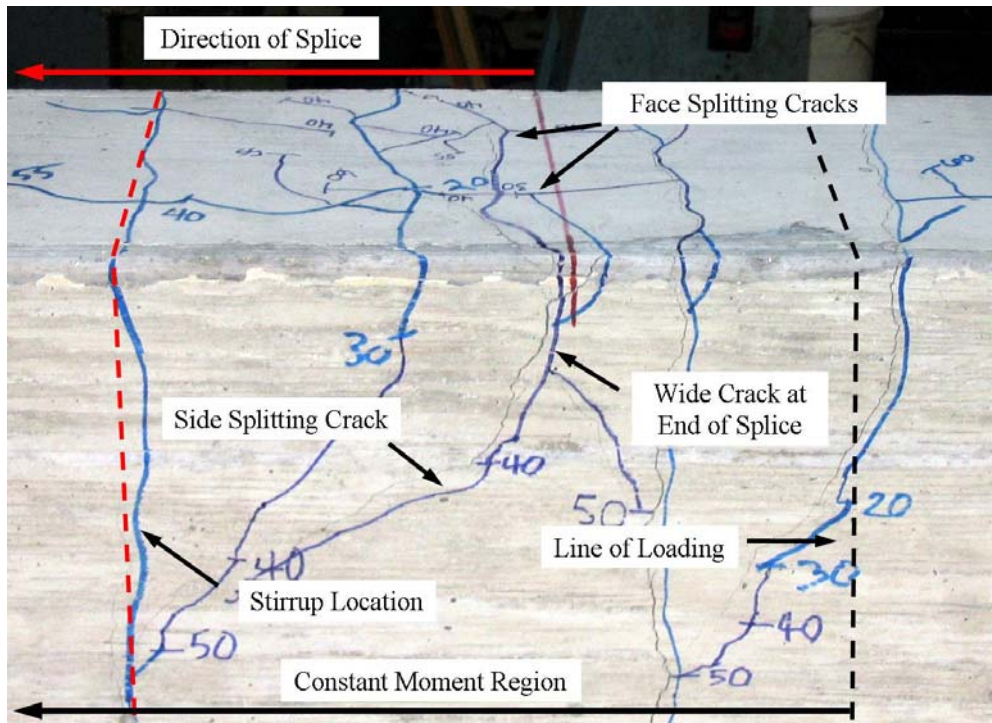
Cracking at the end of typical confined splice at 80% of failure load
